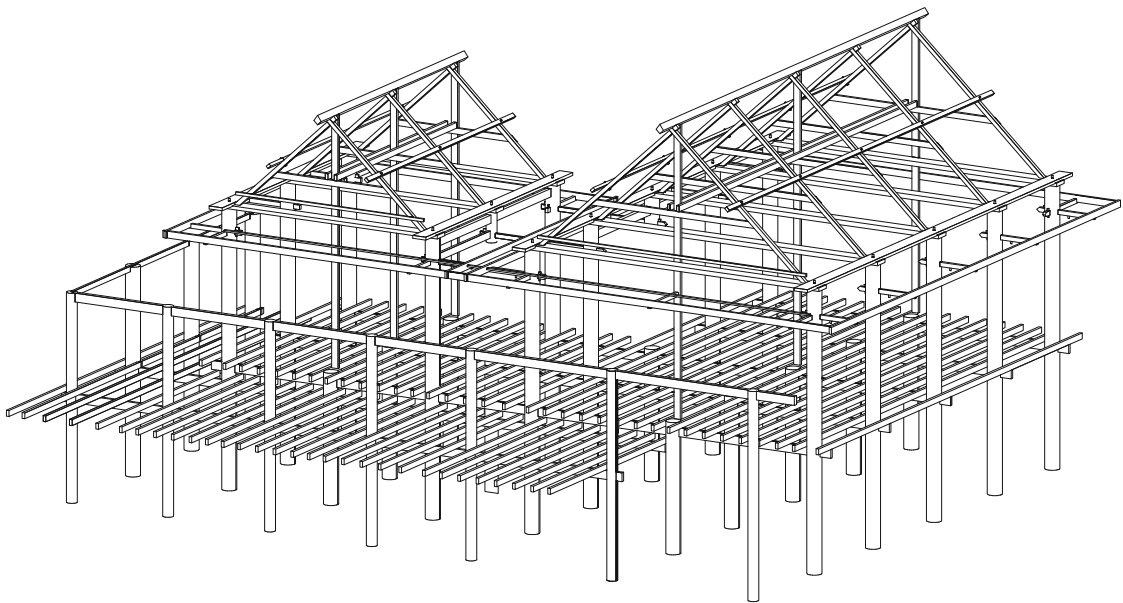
Axonometric view of the Tai Lue house without roof shaping member
